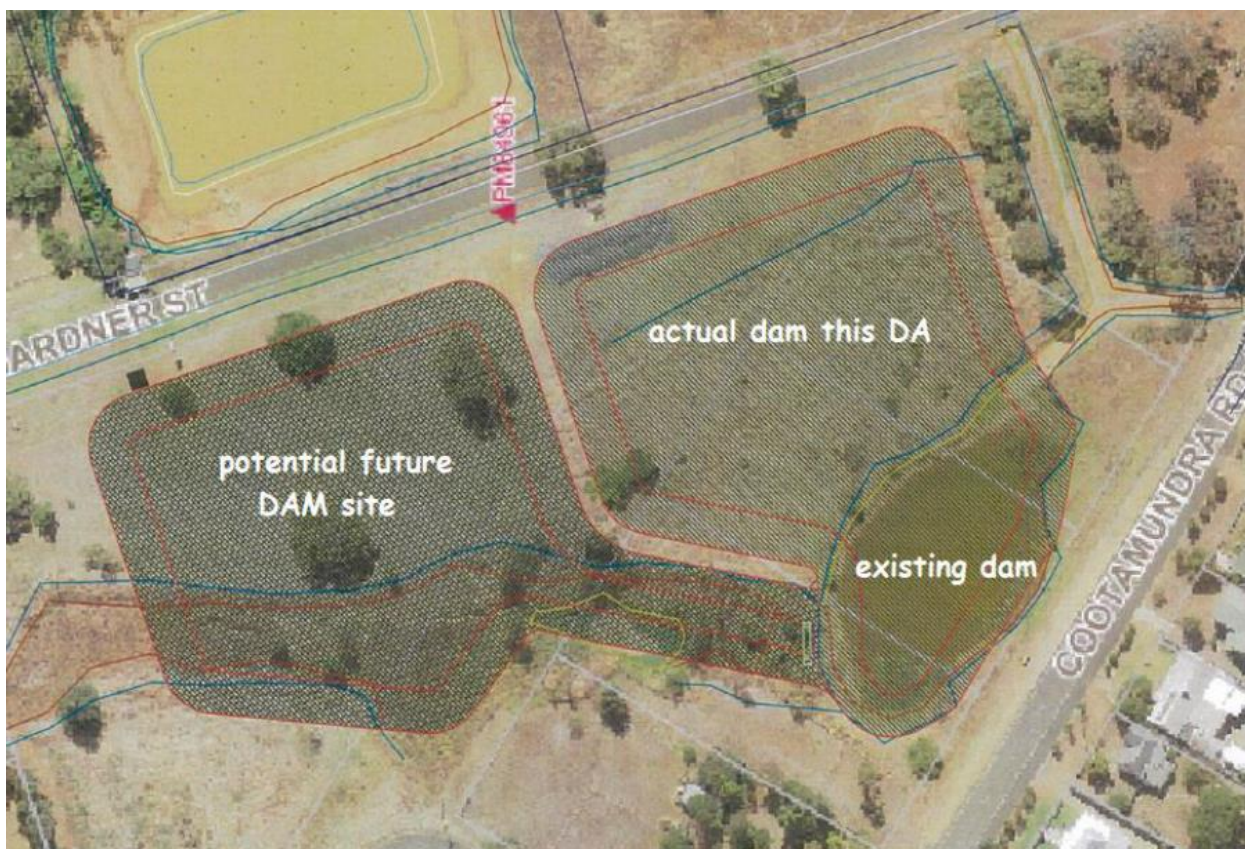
Proposed new dam – expansion of existing dam, and future dam site
